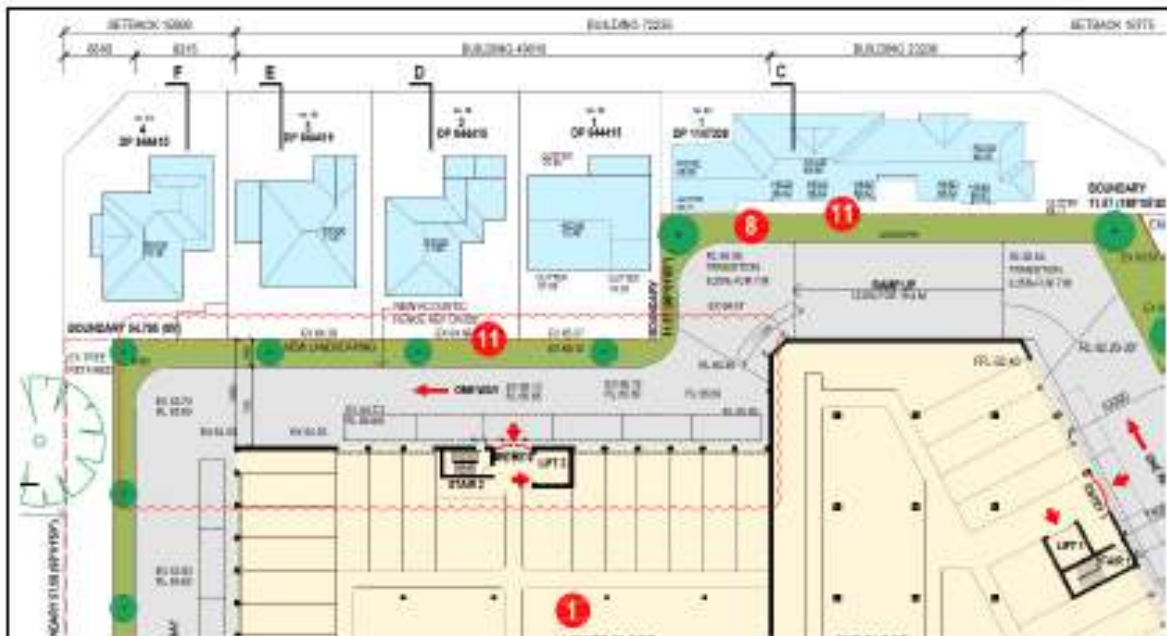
Proposed Site Plan (East) (Harding Architects, 2019)
